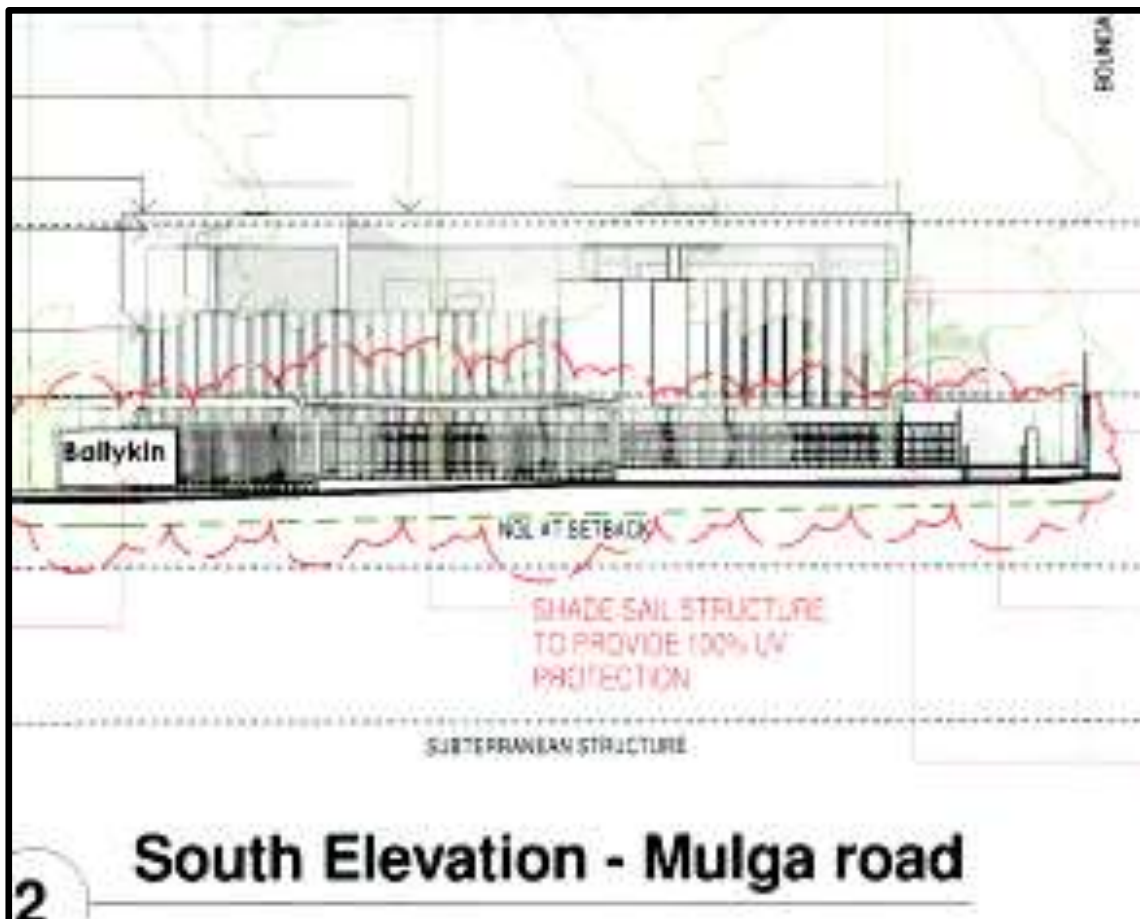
Southern elevation of the approved centre – Mulga Road frontage
